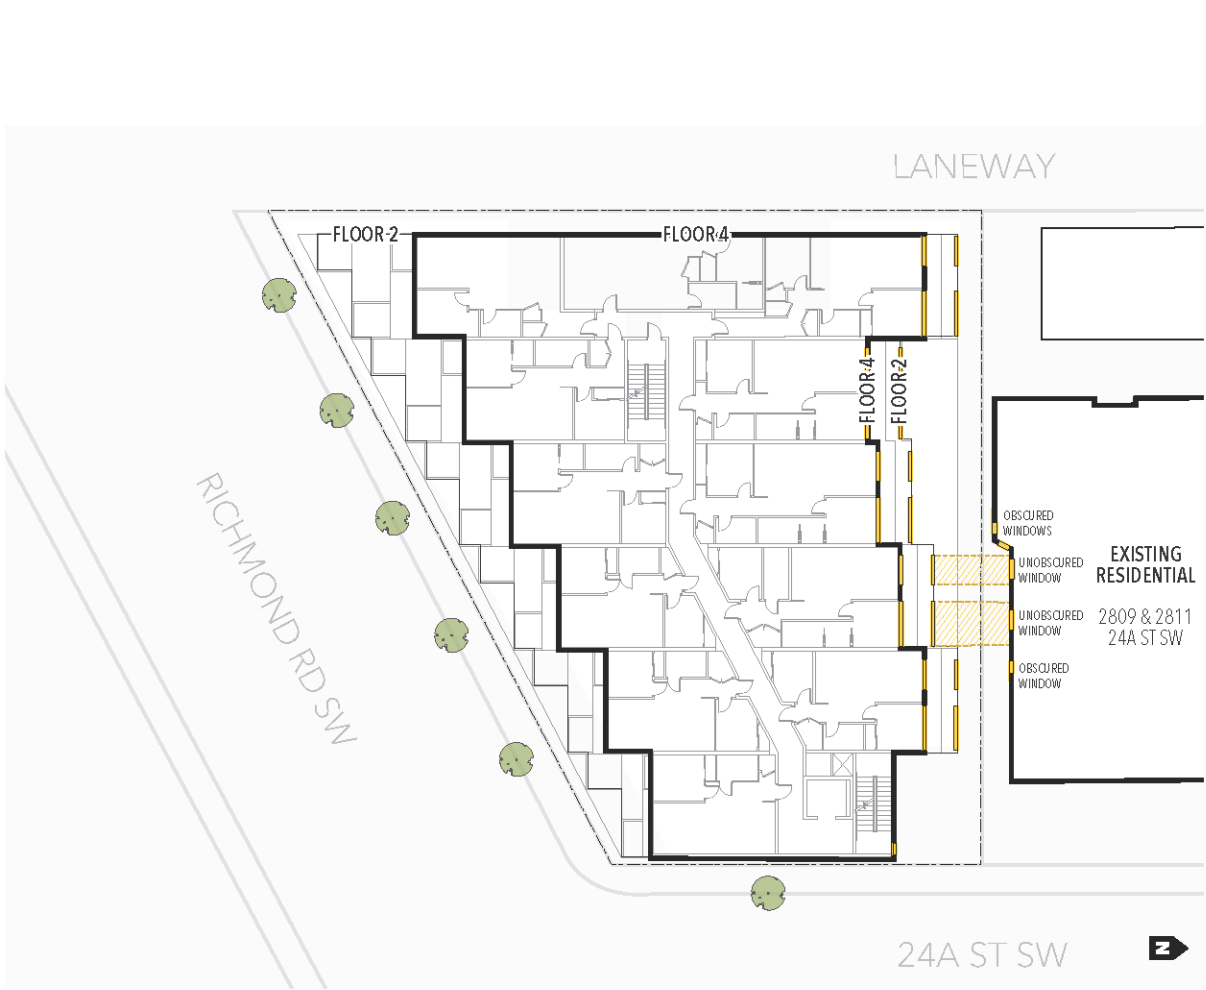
FLOOR 4 PLAN | FLOORS 2 & 4 WINDOWS & SIGHT LINES
